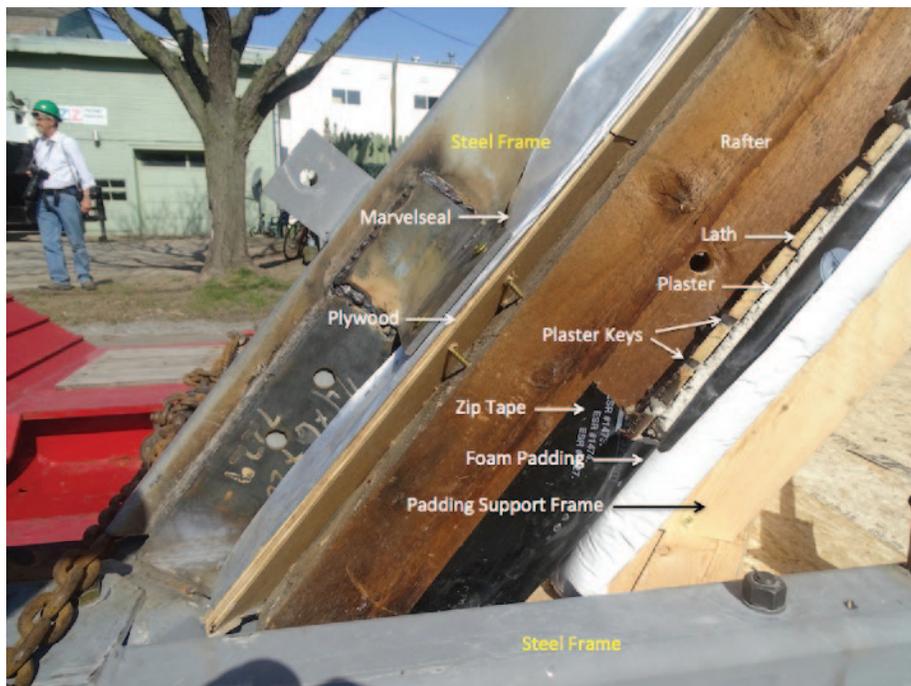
Cross-section of roof structure and mural (Courtesy of Bob Neeld, PE)
